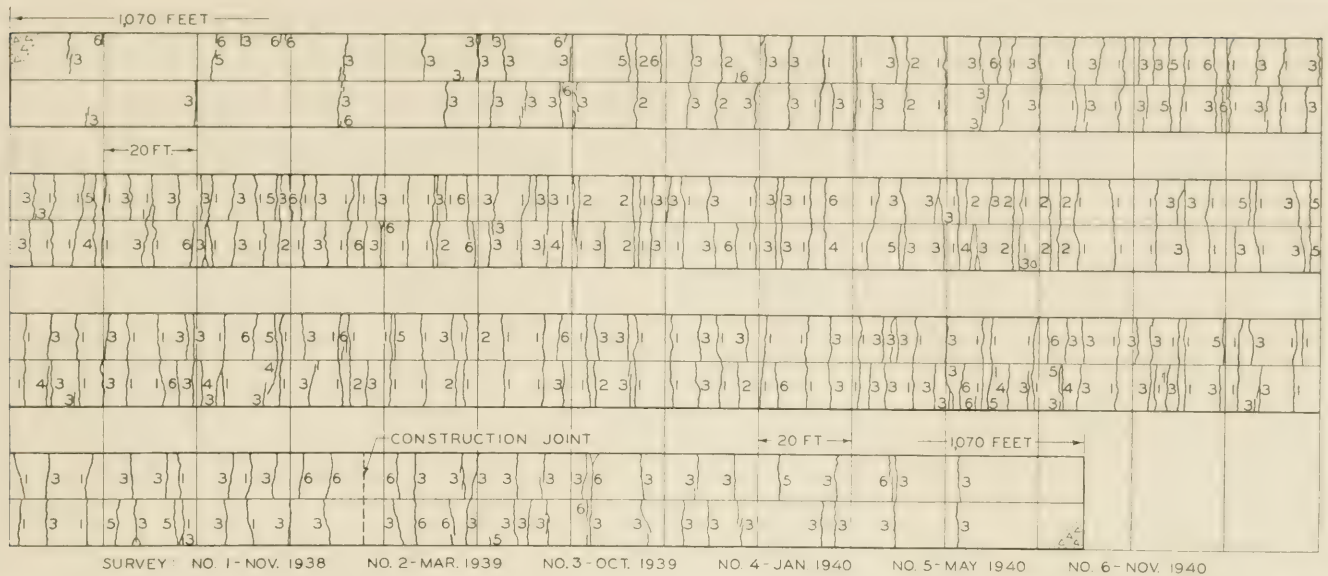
TYPICAL CRACK SURVEY SHEET FOR LONG SECTIONS REINFORCED WITH 1-INCH DIAMETER STEEL; SECTIONS PLACED SEPTEMBER-OCTOBER, 1938.
